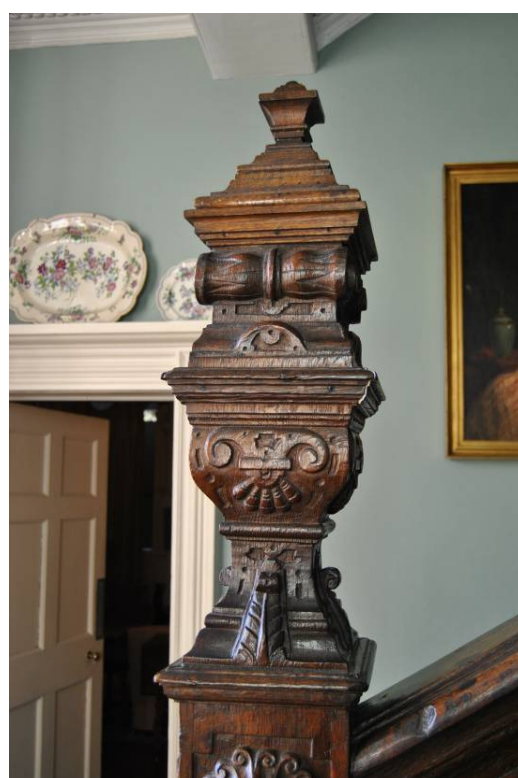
Principal stair; detail of newel finial (top, paler section is secondary, probably C19th).
